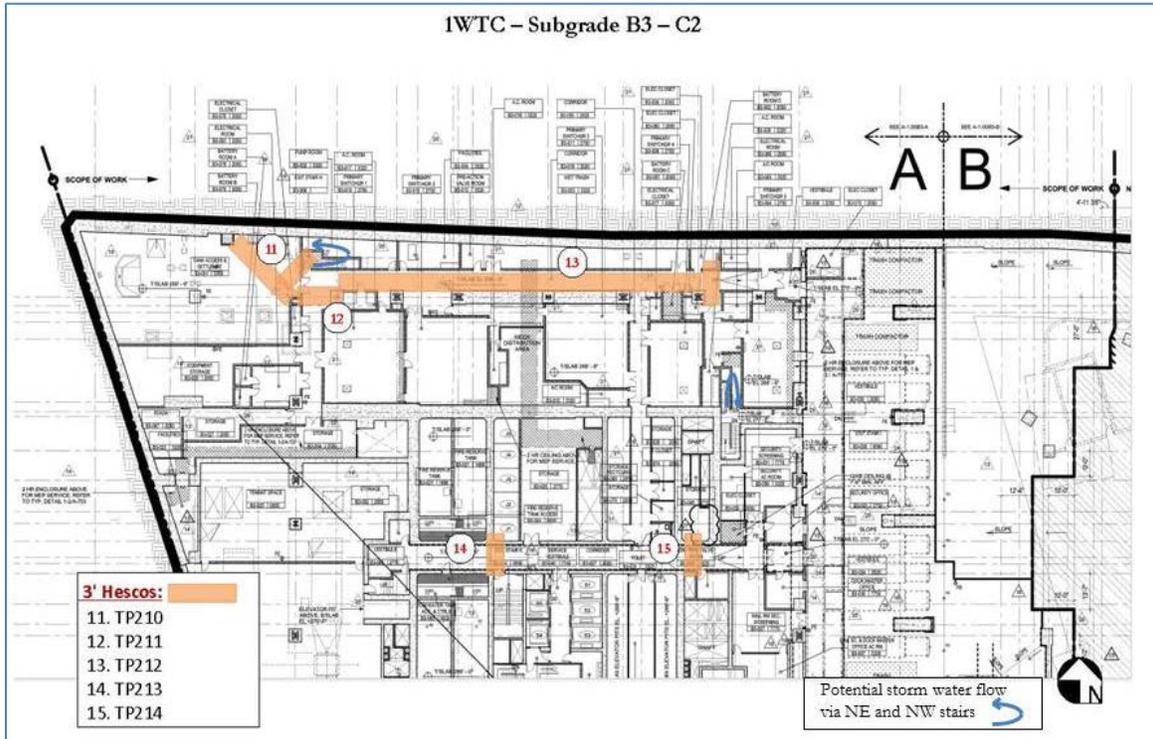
Subgrade Barrier Plan for 1WTC, Floor C2
